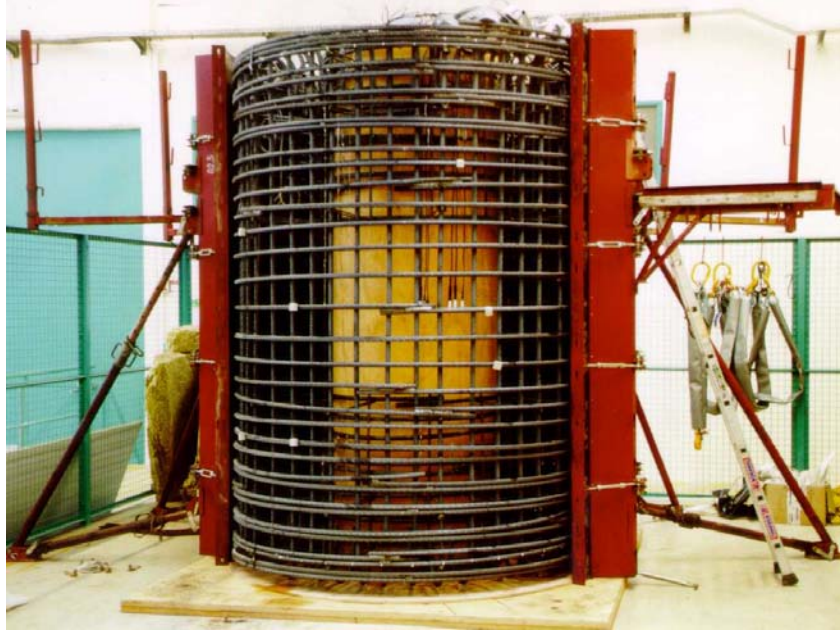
Preparation of a concrete structure to test its long term behaviour under stress
